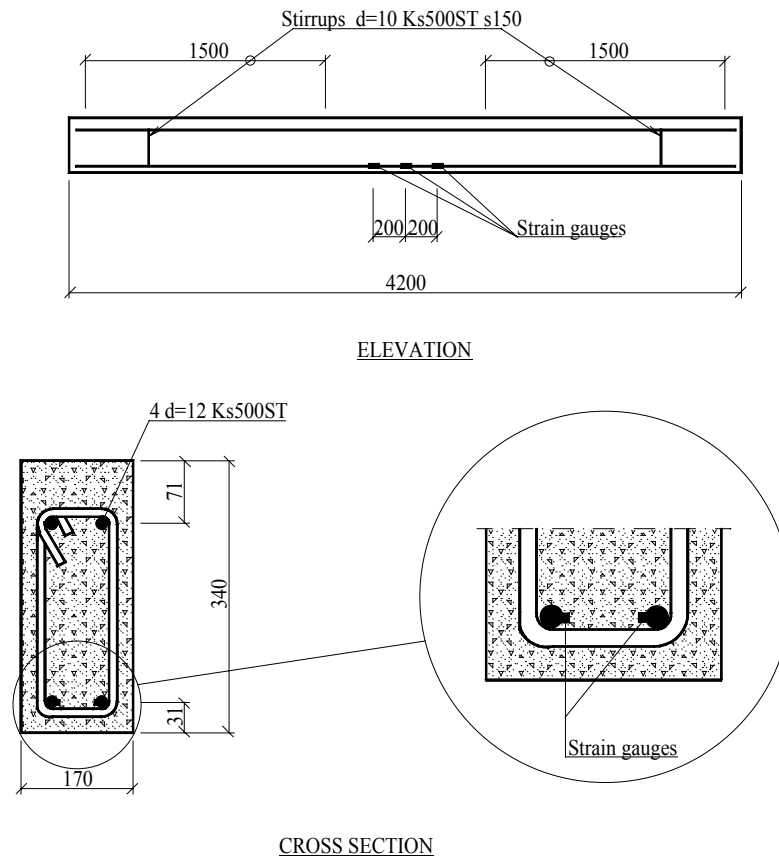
Reinforcement locations and cross section for concrete beams with dimensions in mm.
